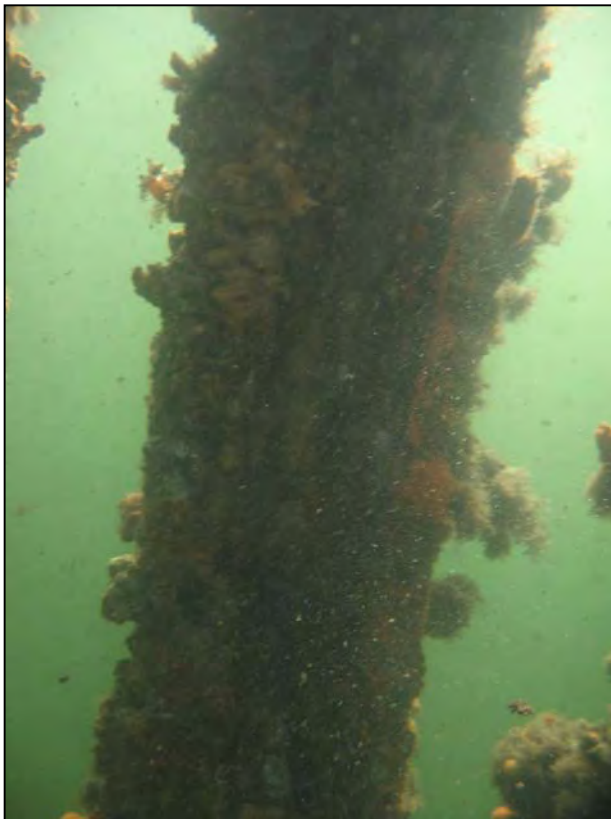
Overview of the underwater portion of timber piles. (Photo by Childs Engineering Corp.)
